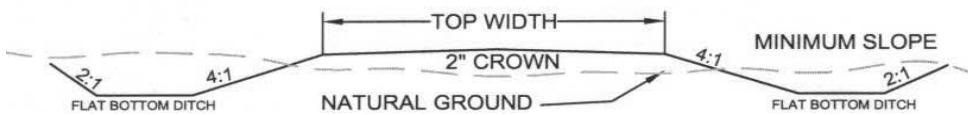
TYPICAL ACCESS ROAD CROSS SECTIONS
